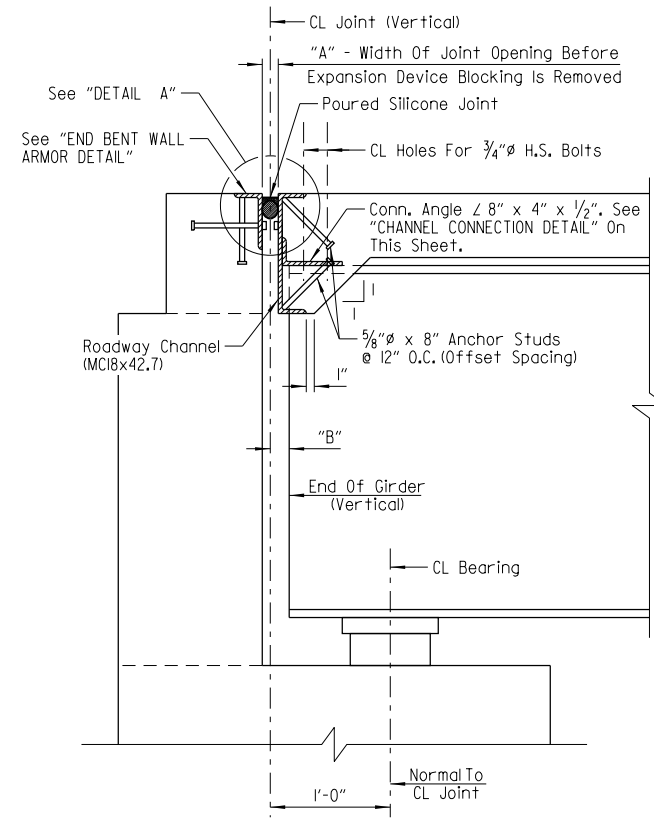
DETAILS FOR BLOCKING EXPANSION JOINT DEVICE
